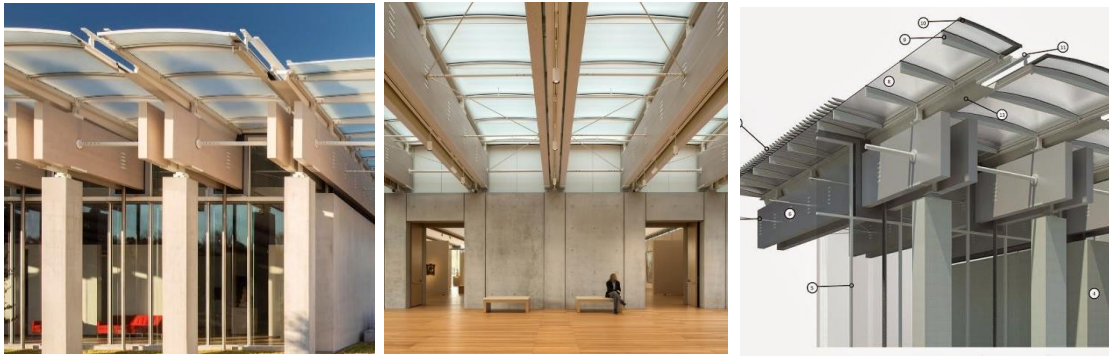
The roof structure of the new Kimbell Art Museum expansion, showing the translucent panels and fixed to the laminated beams (archdaily.com)
